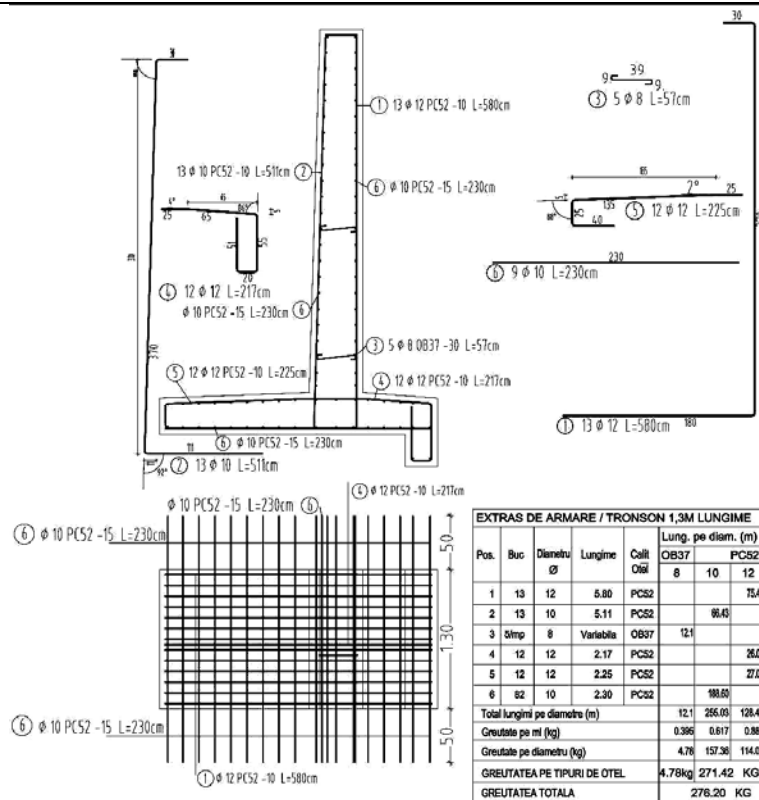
Reinforcing plan for a 1.30 m section length of new designed retaining wall
